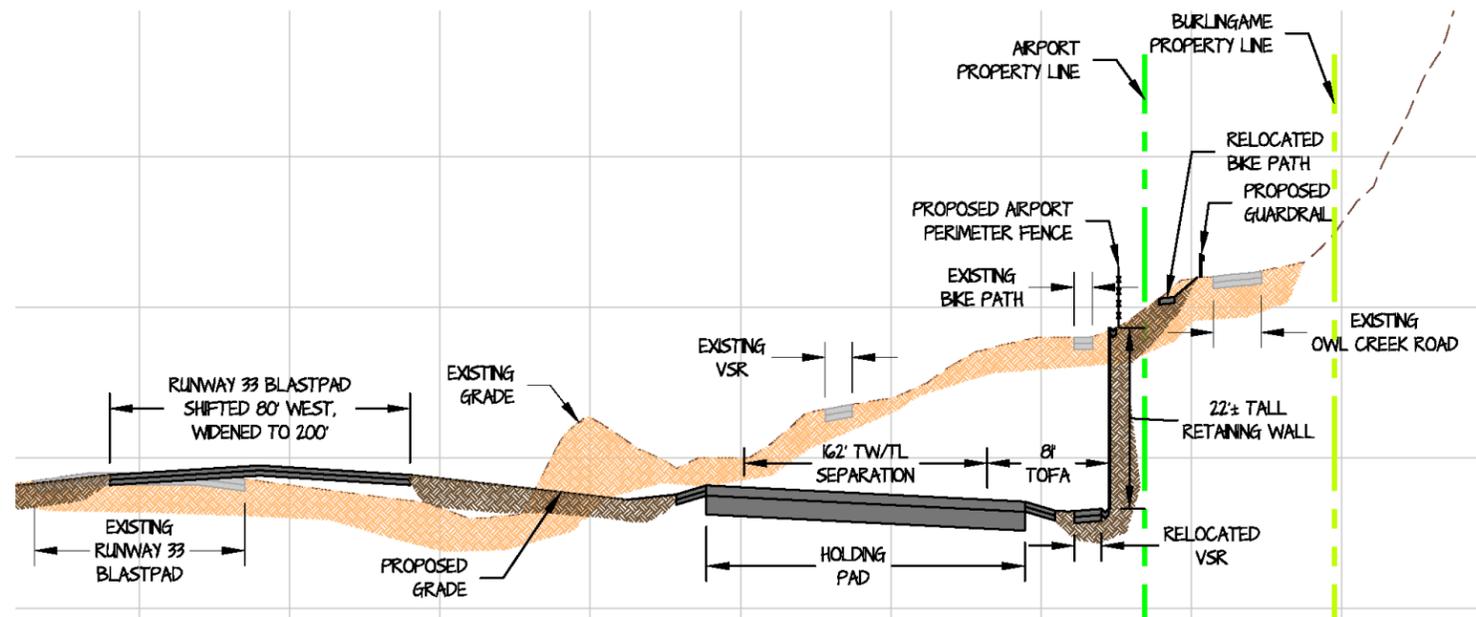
Holding Pad at Runway 33 End (Alternative 8a, Sheet 7 of 29)
